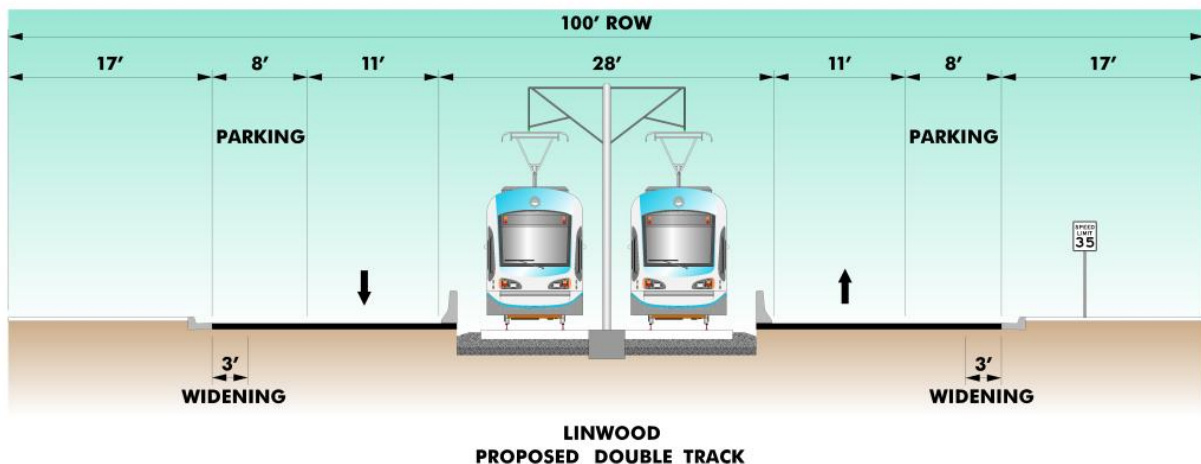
Enhanced Streetcar Linwood Blvd Typical Section
